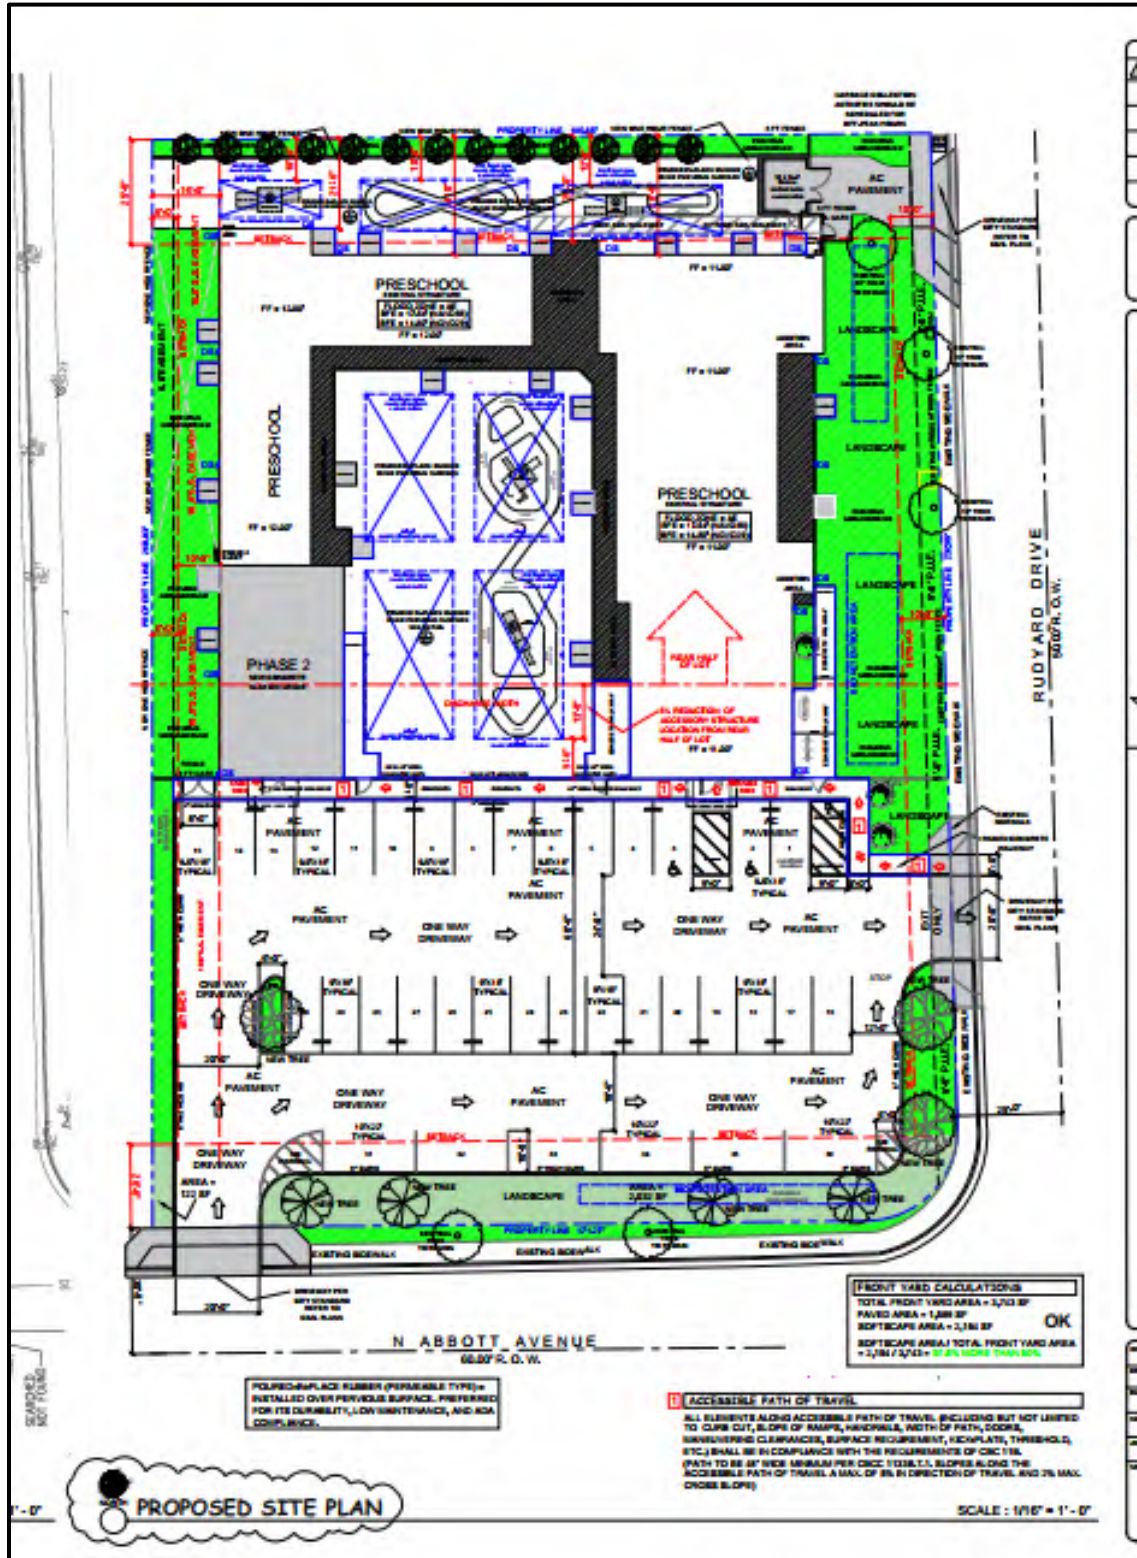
Proposed New Site Plan (Sheet A1, Attachment B)
